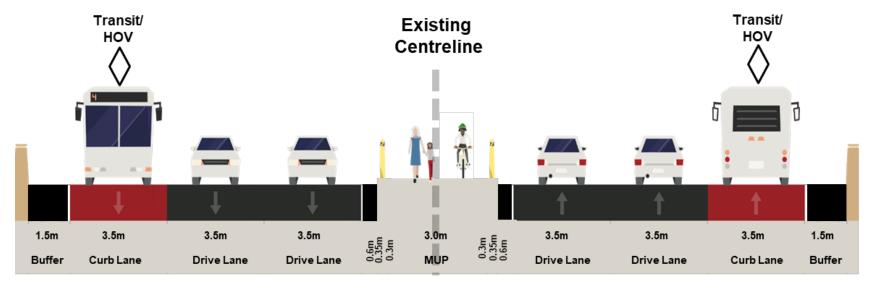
Alternative 2 - No Structure Widening, 1 MUP in Median (No Road Shift)
